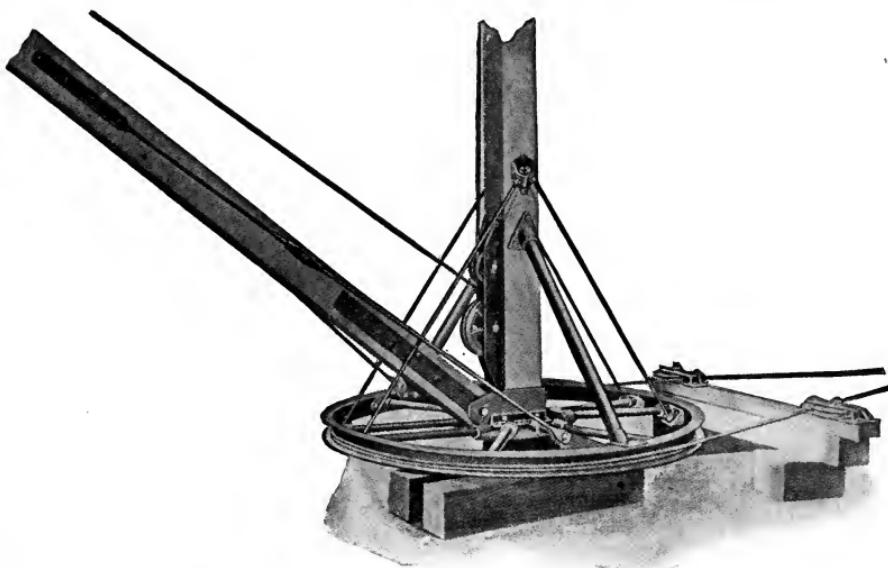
Bull Wheel Used on Derricks for Swinging Boom
